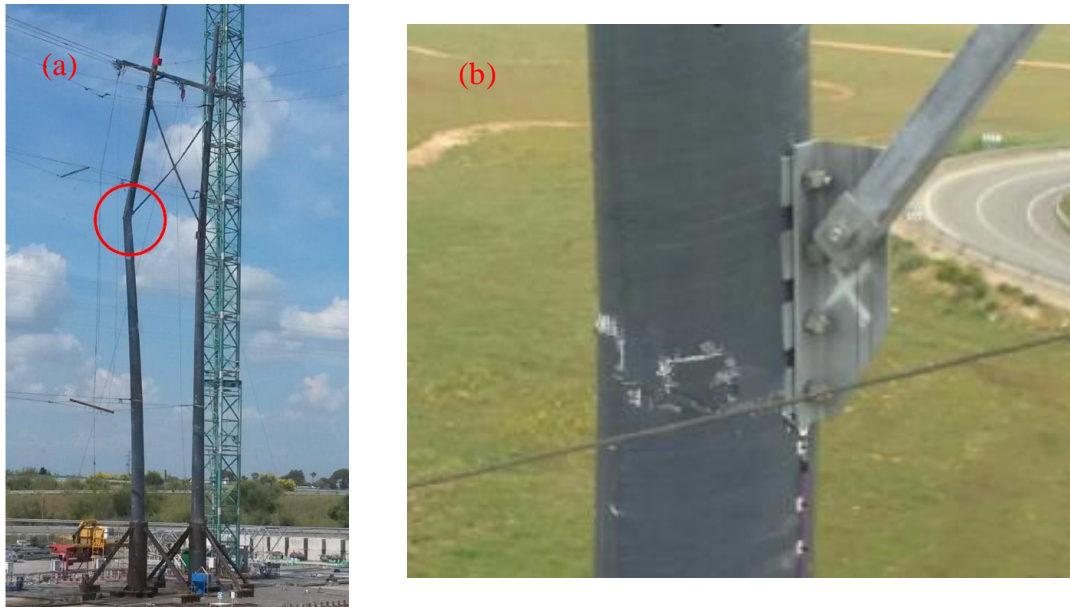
Showing (a) the failure of the FRP structure; and (b) the zoomed failure position.
